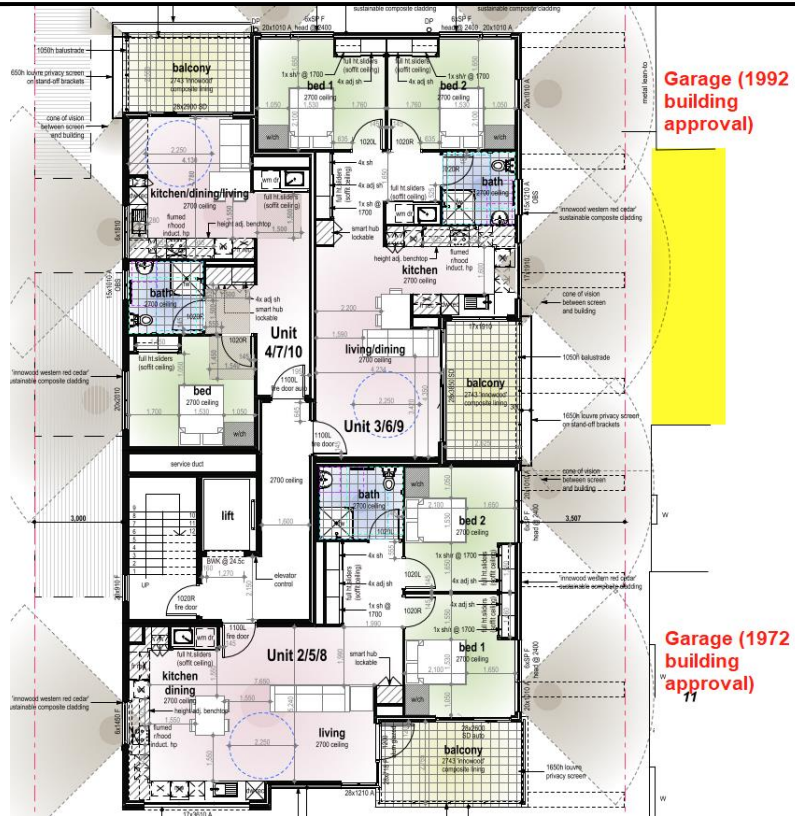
Extract of floor plan indicating cone of vision relative to existing structure on 360 Abernethy Road – driveway highlight in yellow
